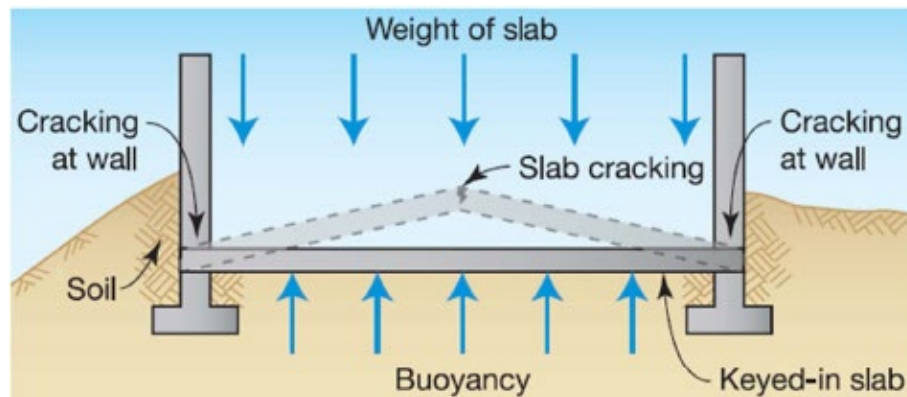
Mehrshad and Memari, Slab and wall cracking for keyed-in slab, 2021.
